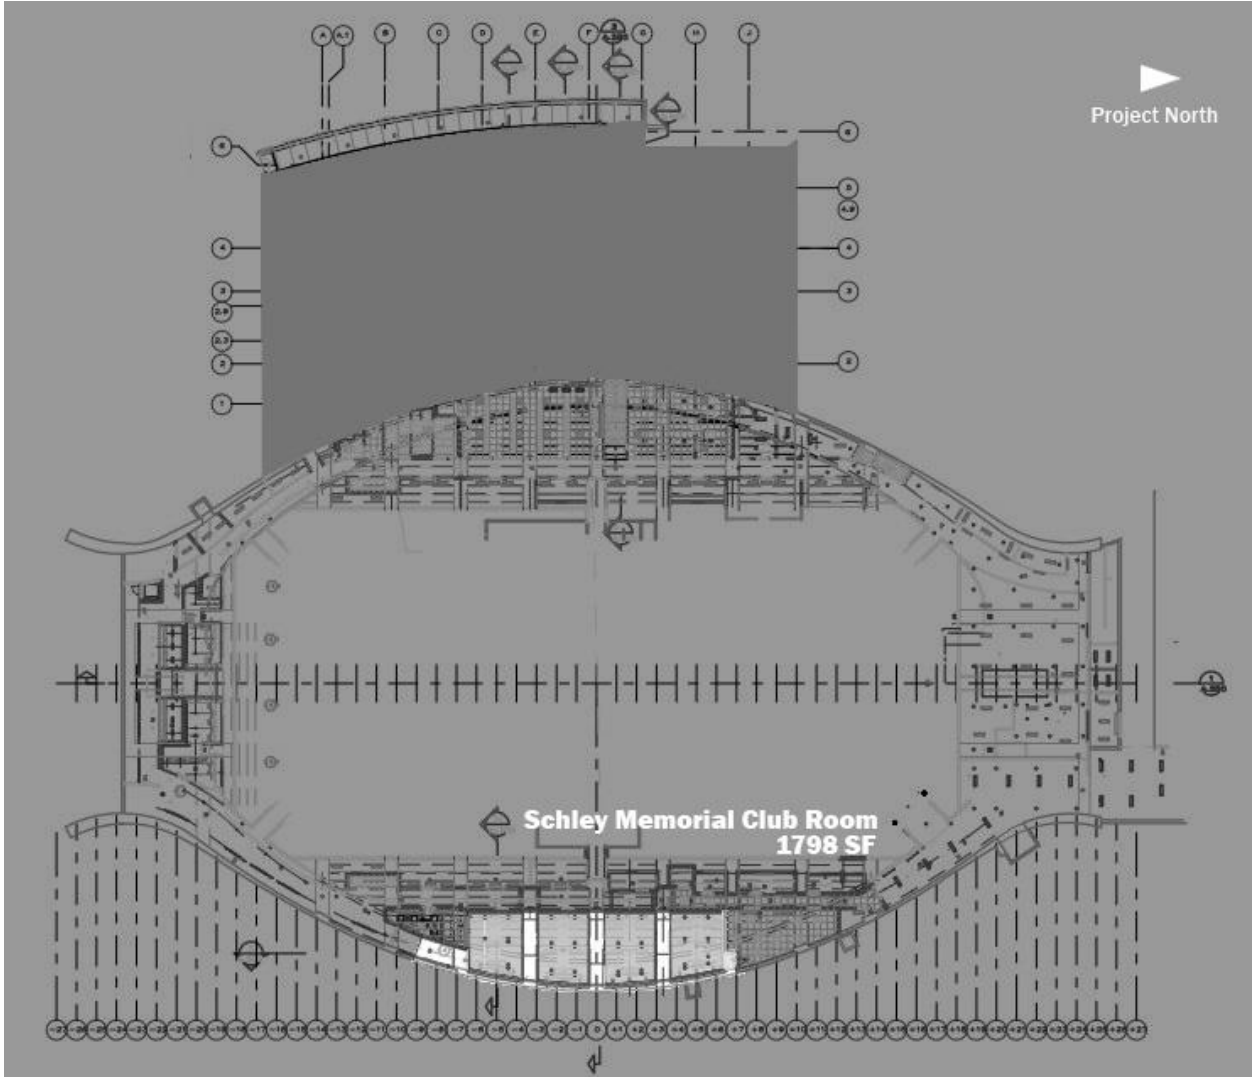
| Basement Floor Plan – Schley Memorial Club Room
